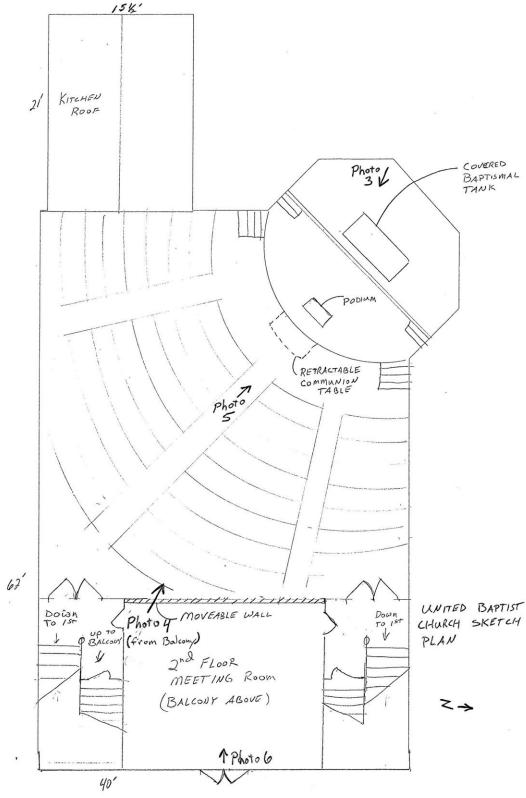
United Baptist Church 2nd floor sketch plan and photo key
